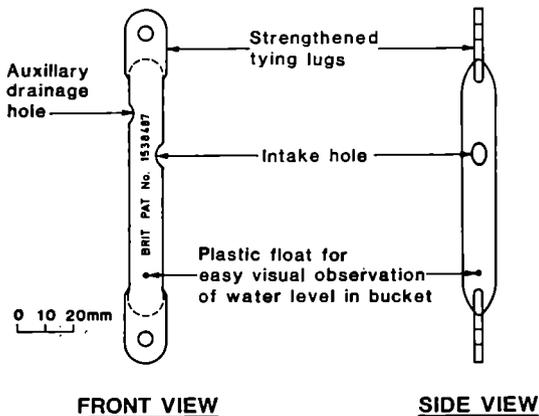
Halcrow Plastic 'Buckets' Used for Recording the Maximum Water Elevation Attained in a Standpipe Piezometer
